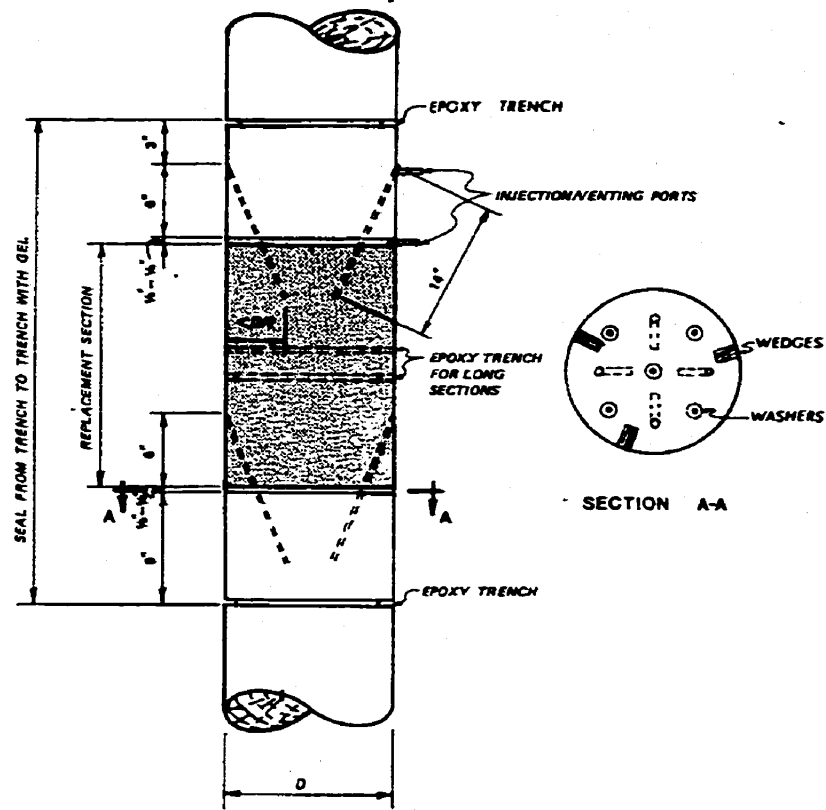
Schematic of Cutting and Posting Timber Pile Repair (Avent, 1986)
